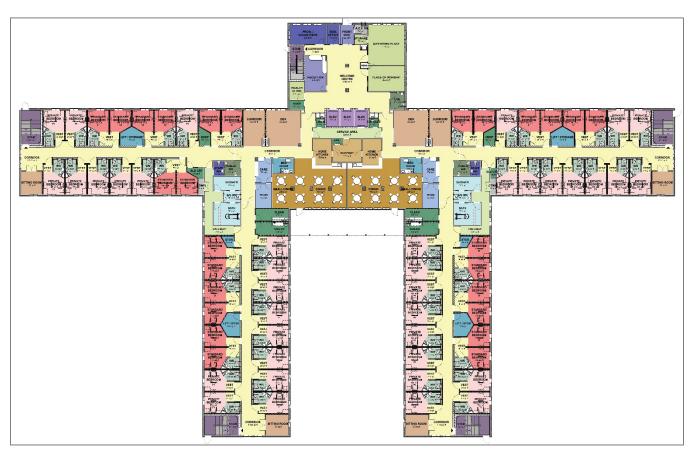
Layout of Resident Home Areas and Communal Facilities (extract from preliminary floor plans)
